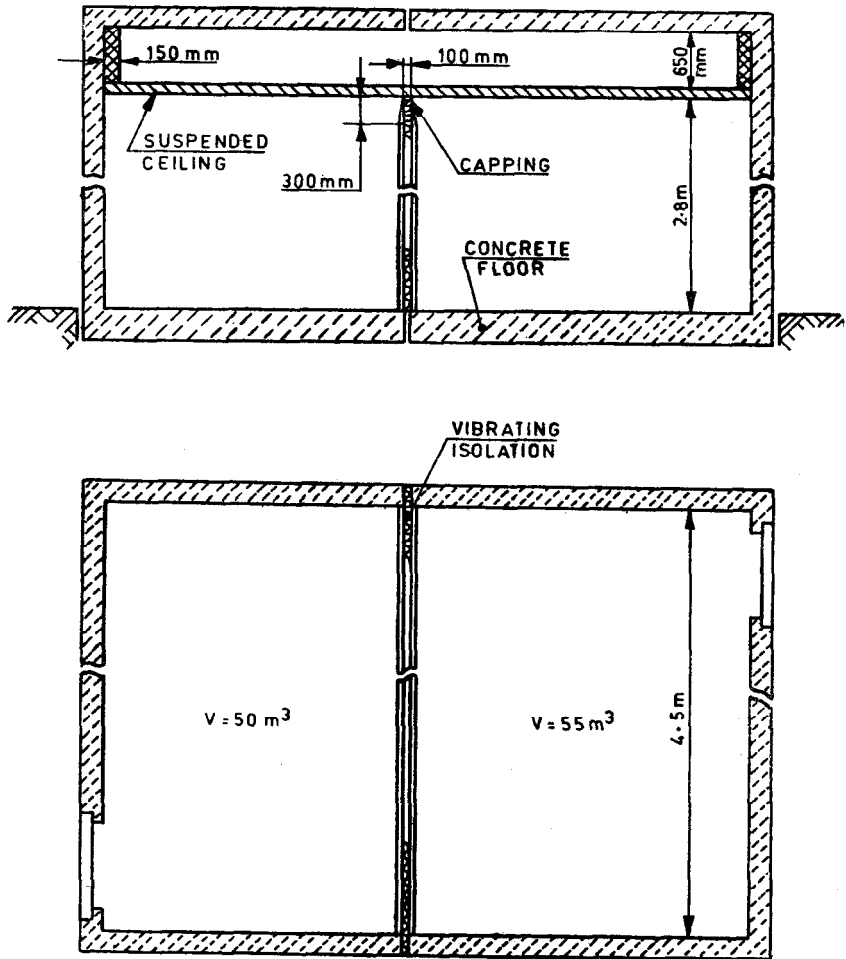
CROSS-SECTION AND PLAN OF THE TEST FACILITY
